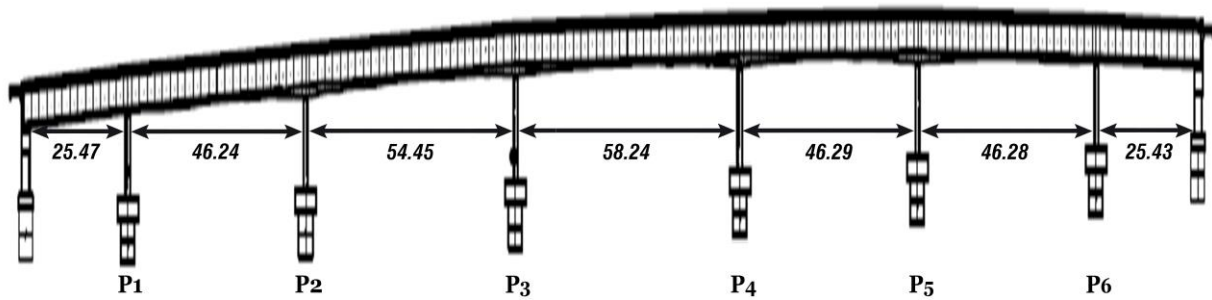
Longitudinal profile of the Hesarak Bridge (unit in m) [17]
